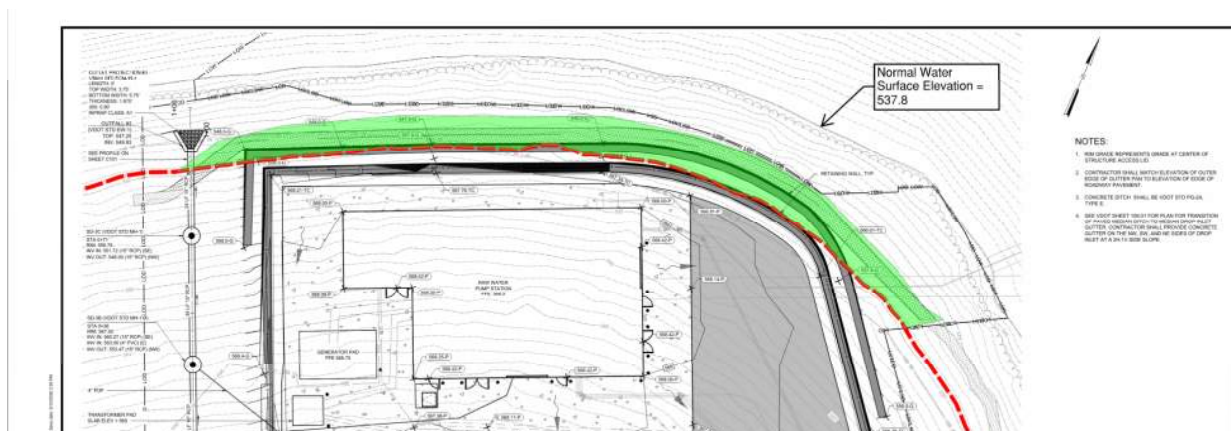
Site Plan with Flood Elevation and Fill Area
